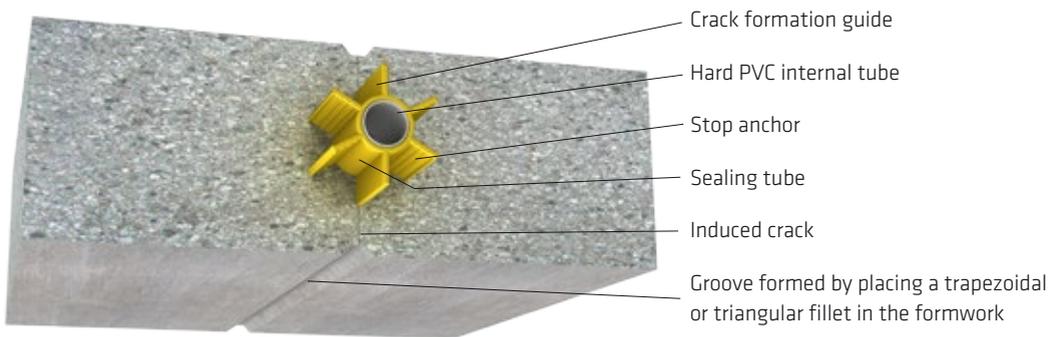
Crack inducing sealing tube for forming and sealing induced crack wall sections (view onto the wall from above)
